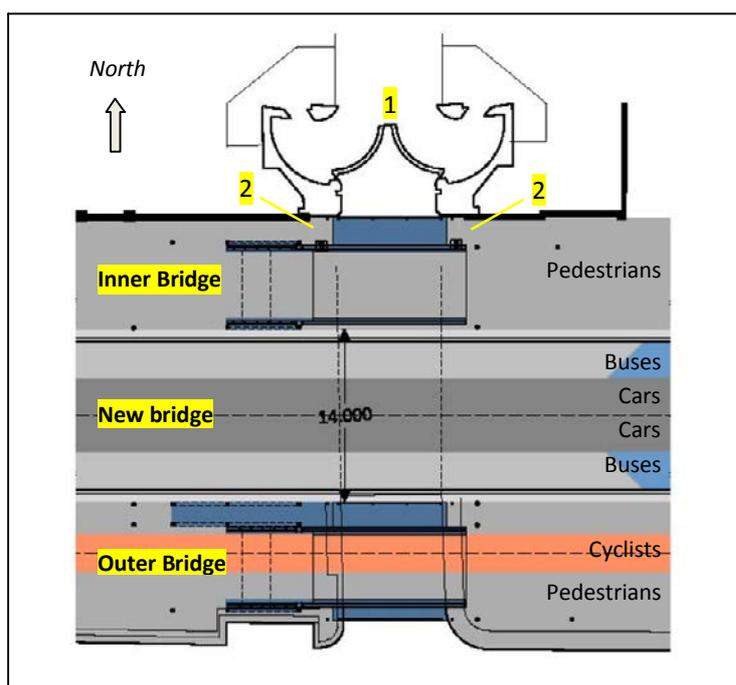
Plan of proposed reconfiguration of bridges over Royal Canal. Key: 1 - Sea lock bottom gates (modern); 2 - Winches to operate previous gates (underneath repositioned Inner Bridge).
